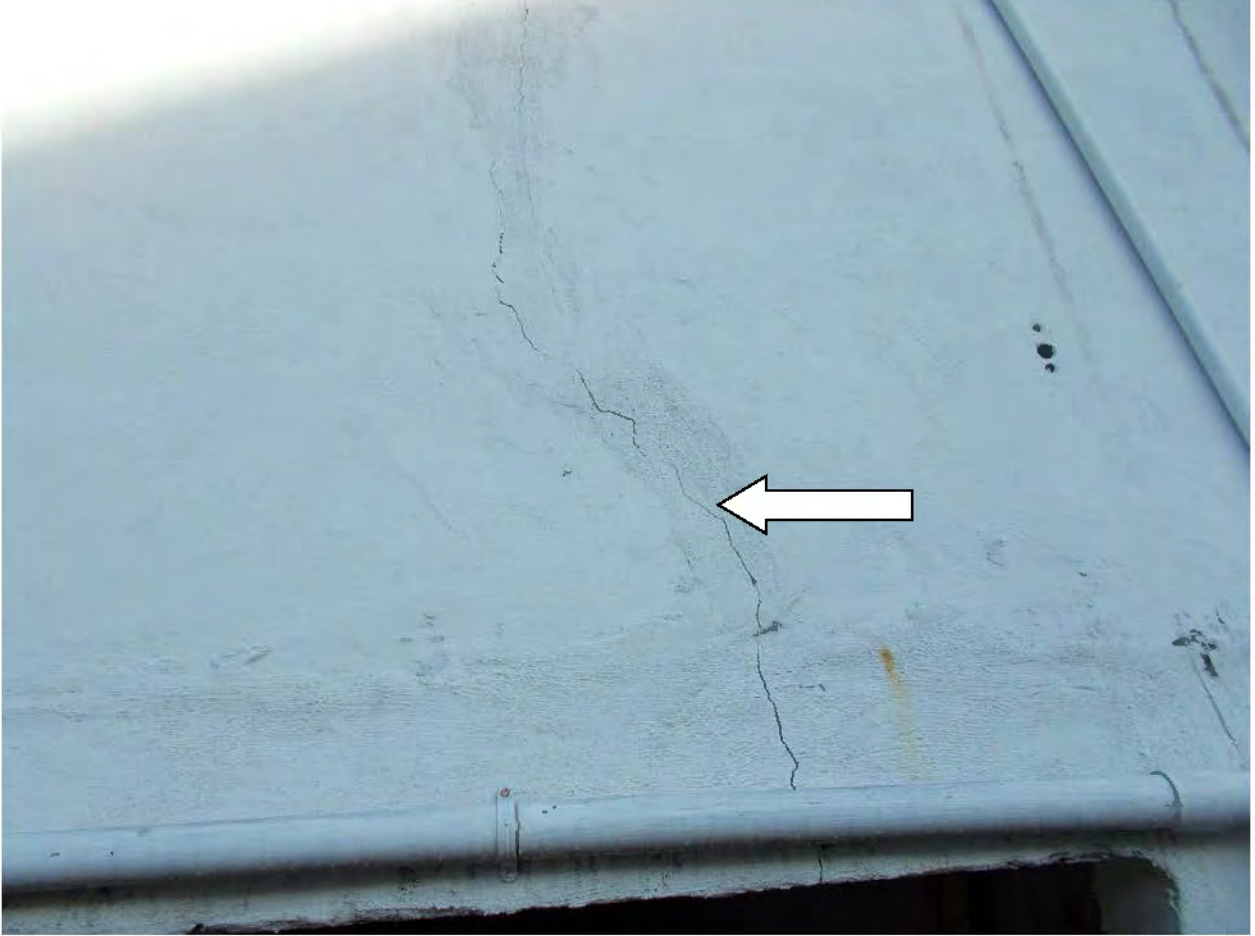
Cracking on the south exterior façade above the lintel/garage door opening
